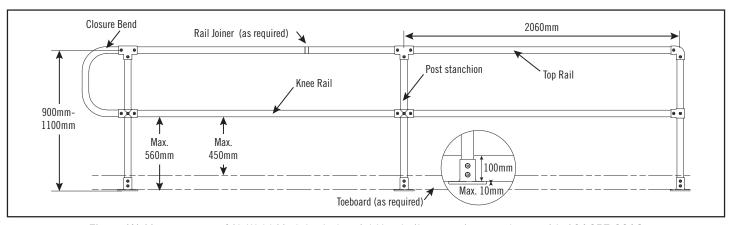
Measurement of NoWeld Modular Industrial Handrail system in accordance with AS1657:2018
